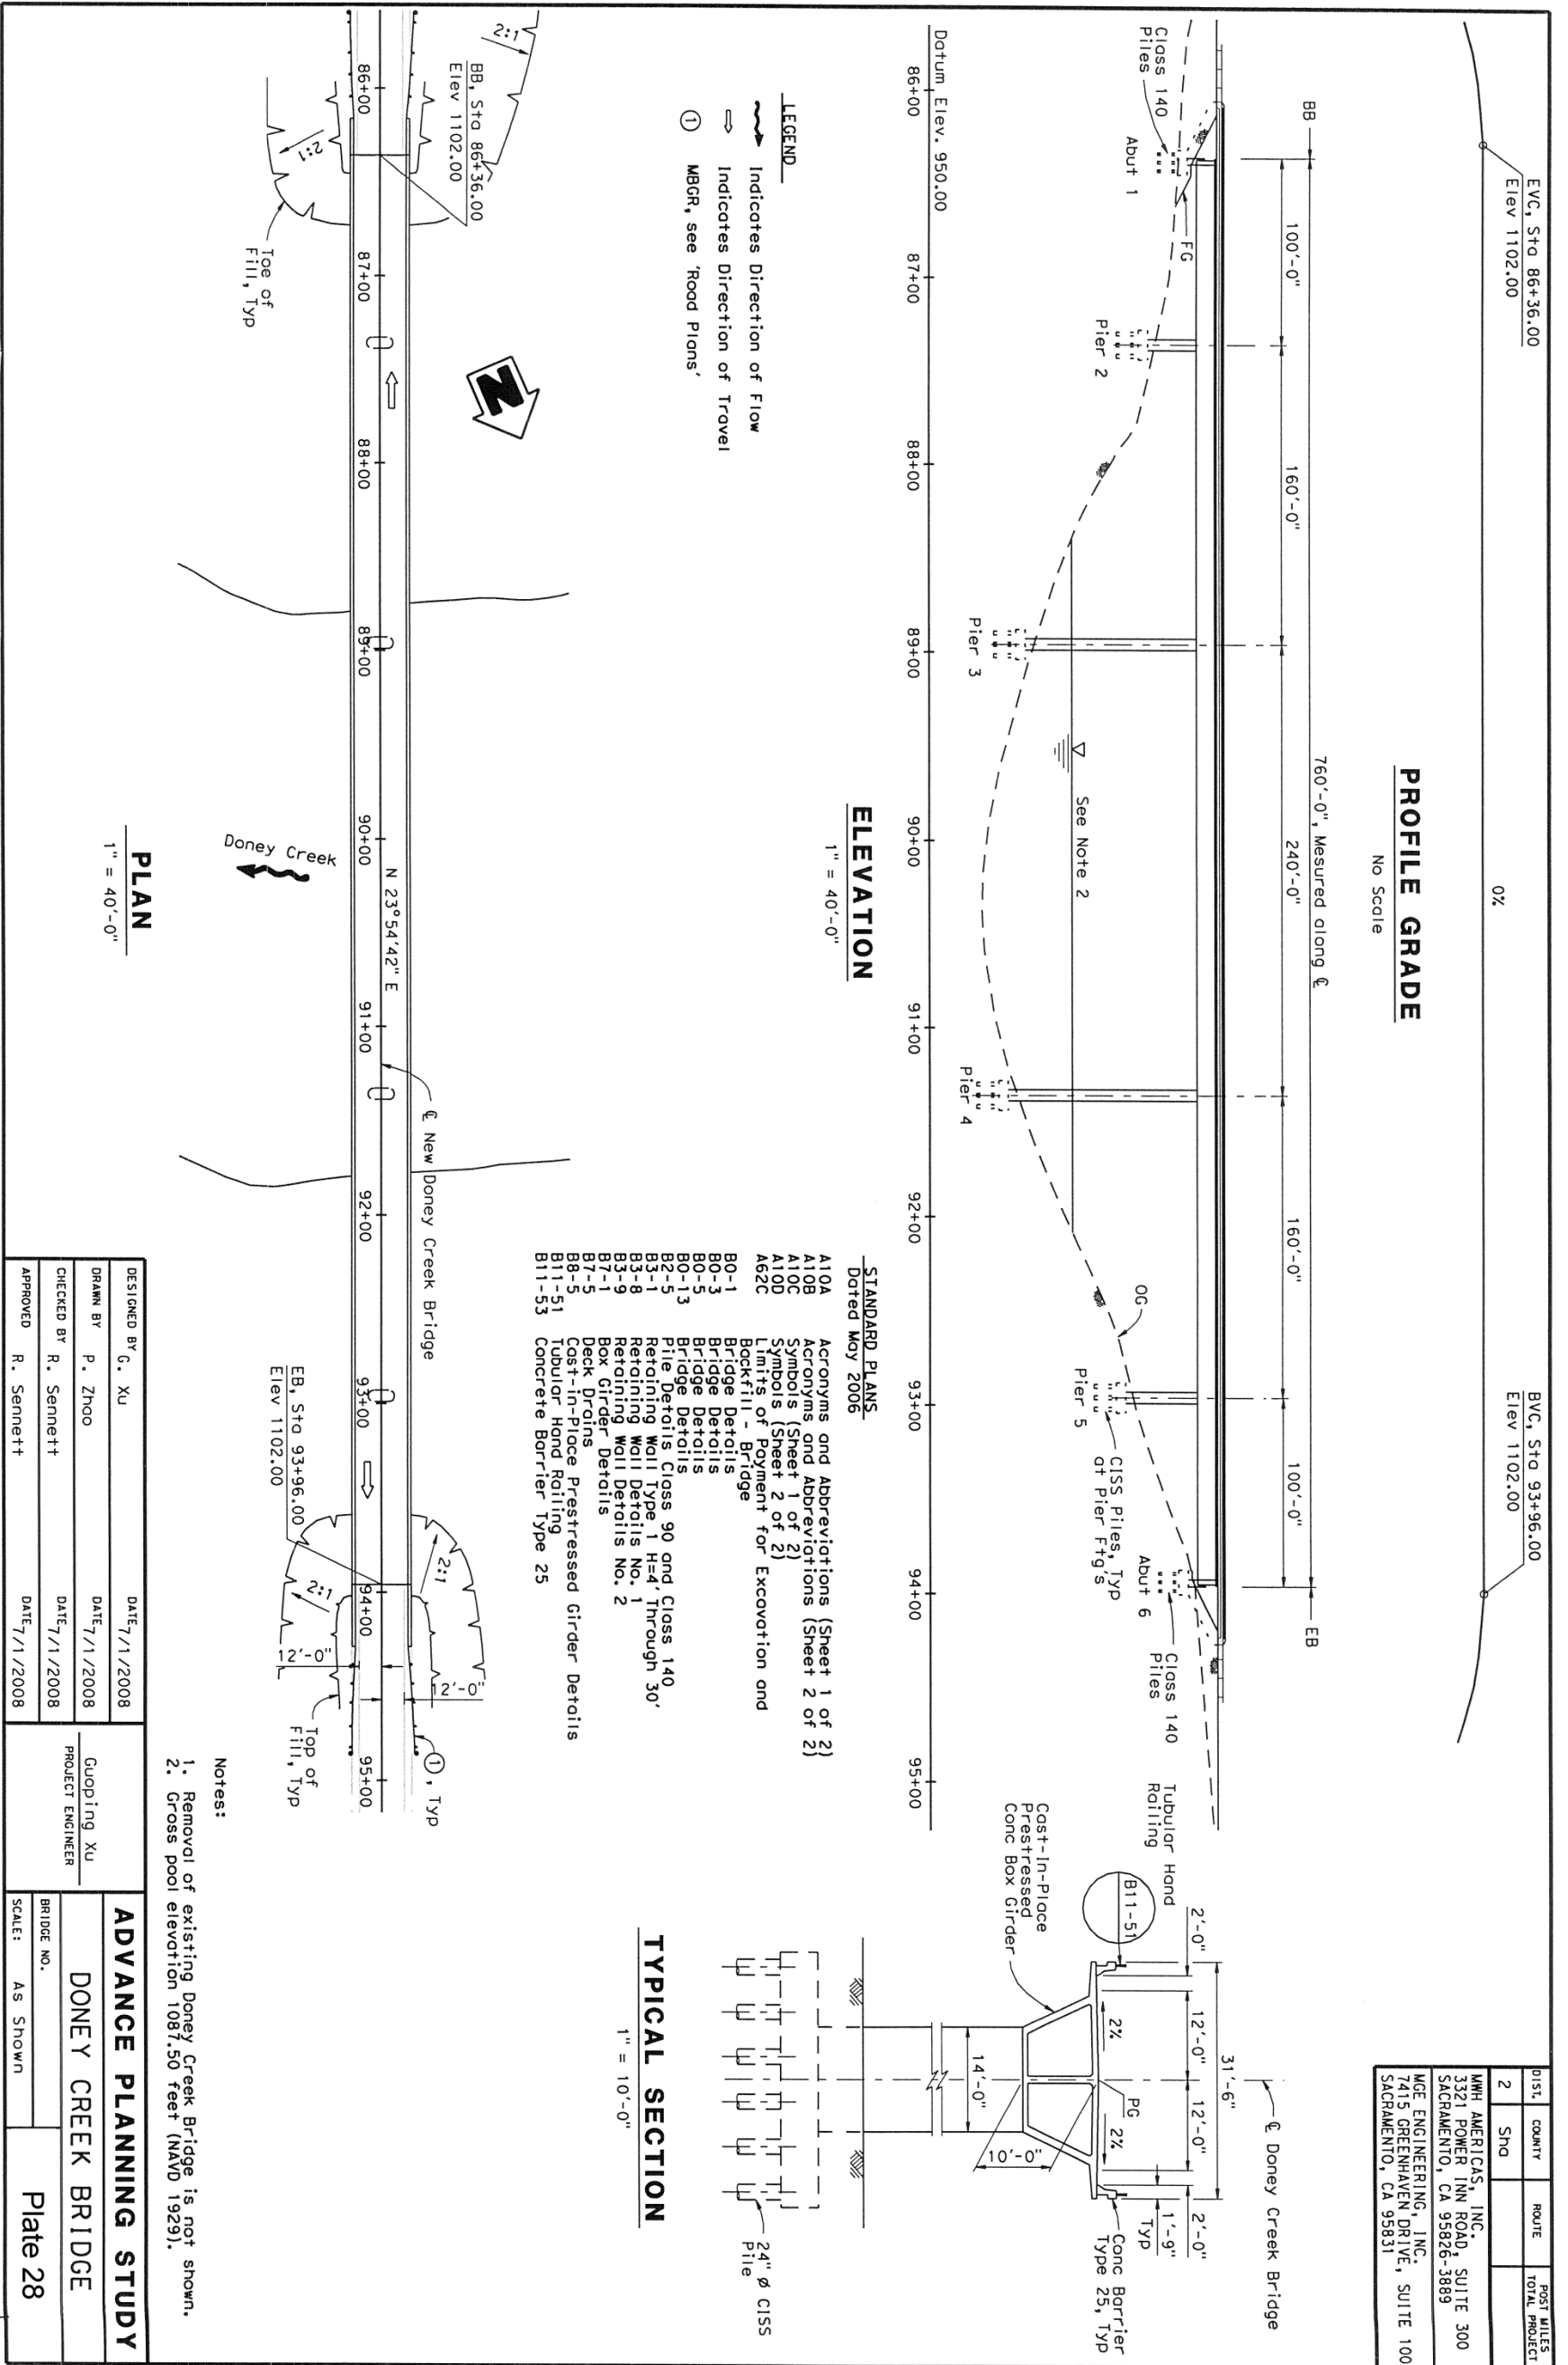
Doney Creek Bridge – Elevation, Plan, and Section
